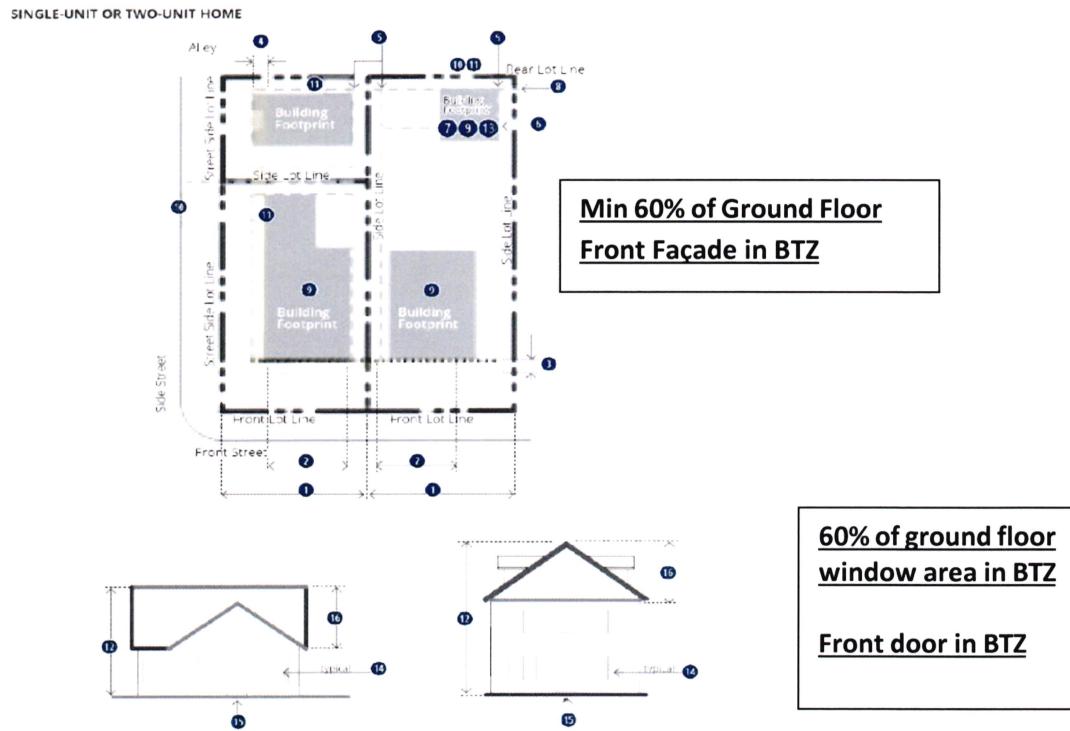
(1). N1 district diagrammatic plans and elevations.
